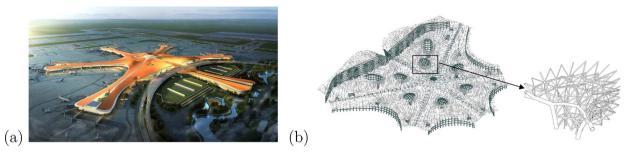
Beijing new airport terminal. (a) Bird view; (b) structural form of the airport roof and a typical C-shaped column.
